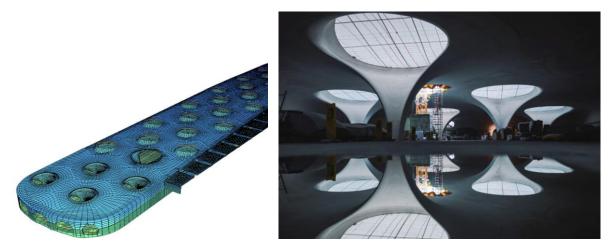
Railway Station "Stuttgart 21". Left: FE-model of the railway station (© Werner Sobek AG) Right: View of the underground station at the final stage of the construction works in 2023 (© Moritz Metzger)
